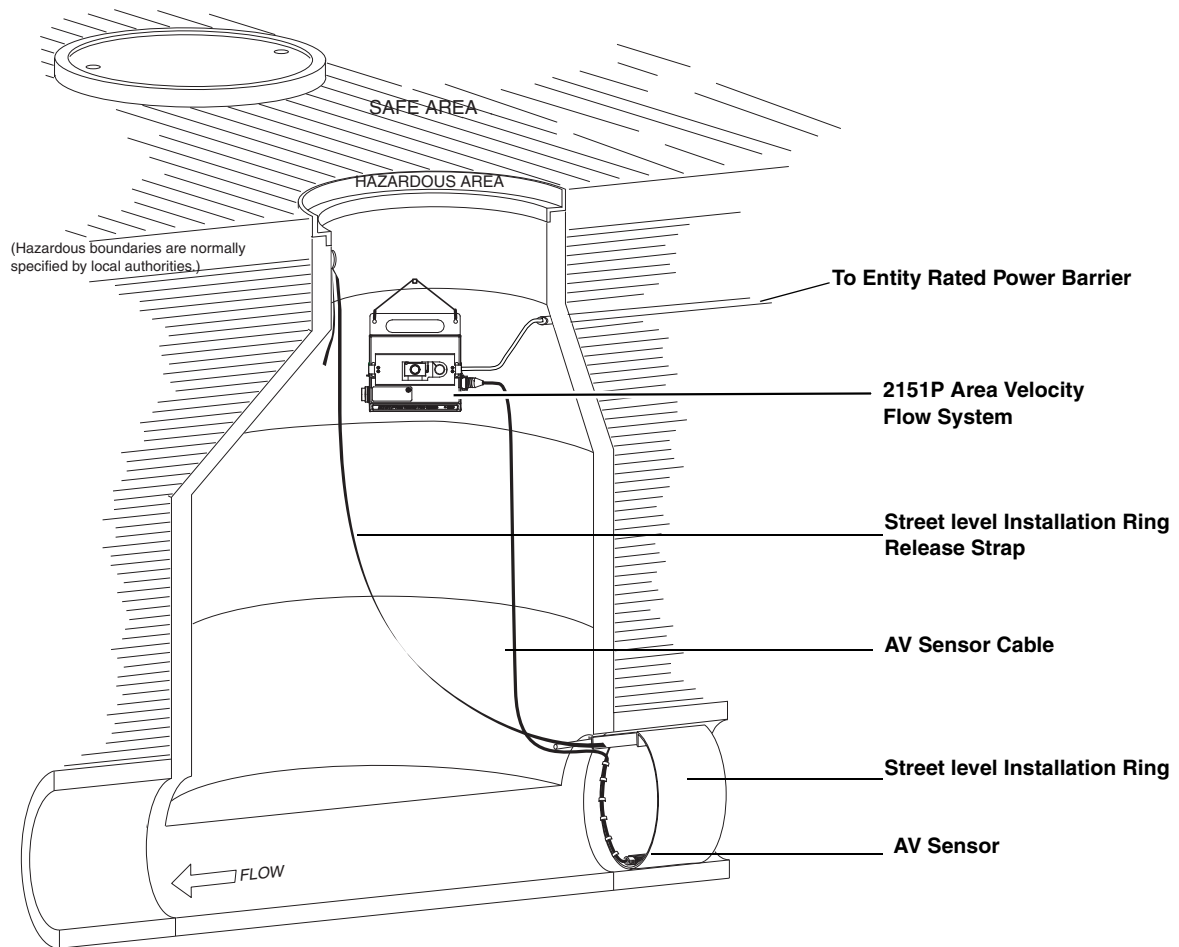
Mounting the 2151P in a Typical Round-pipe Installation
